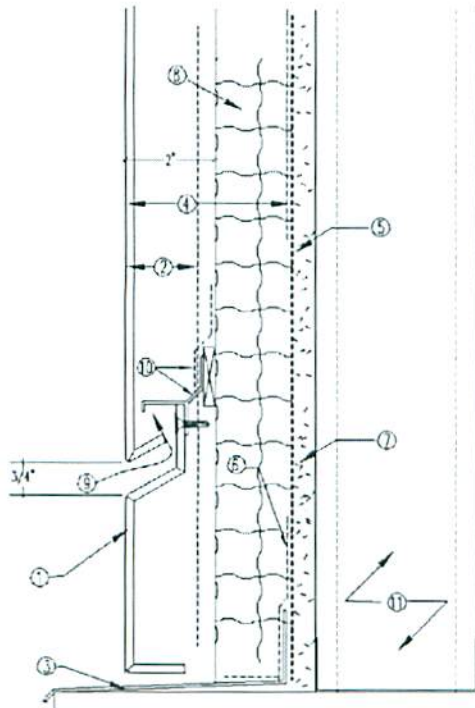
Typical horizontal joint detail for Rainscreen PE/C panel system.
